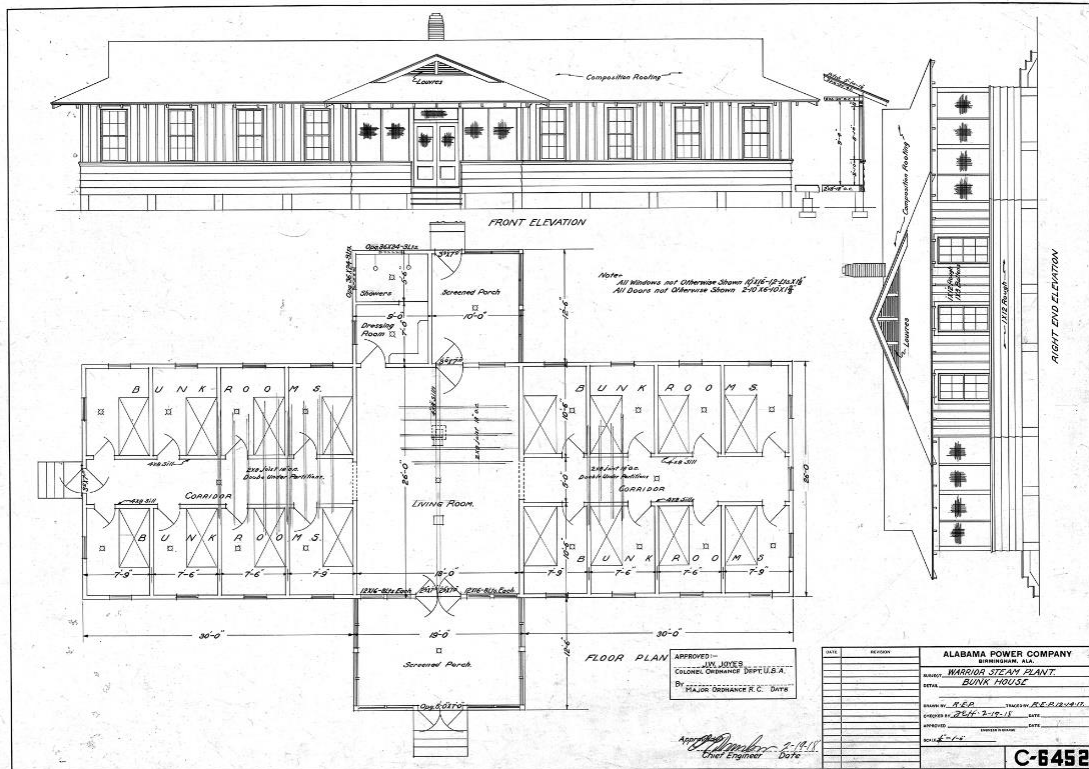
Bunkhouse, Gorgas Camp 2-19-1918.
